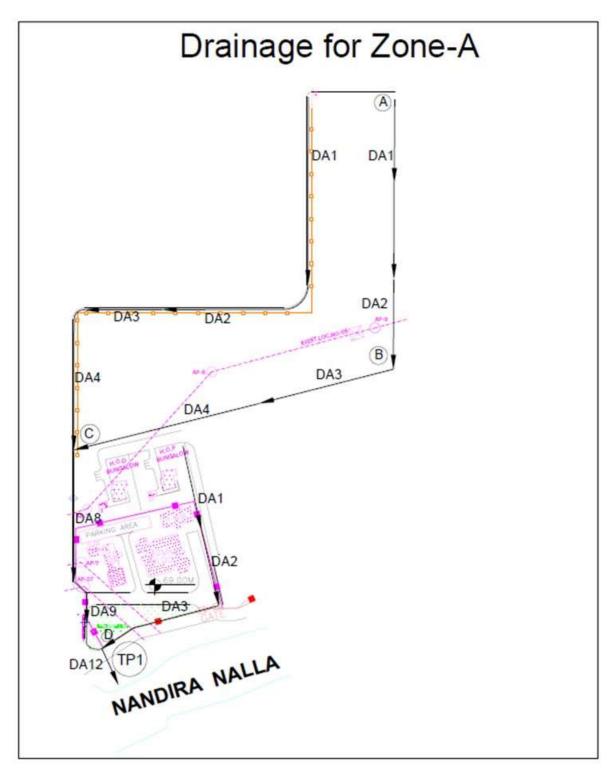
A Zone drainage plan showing drains, longest flow path and outfall location
